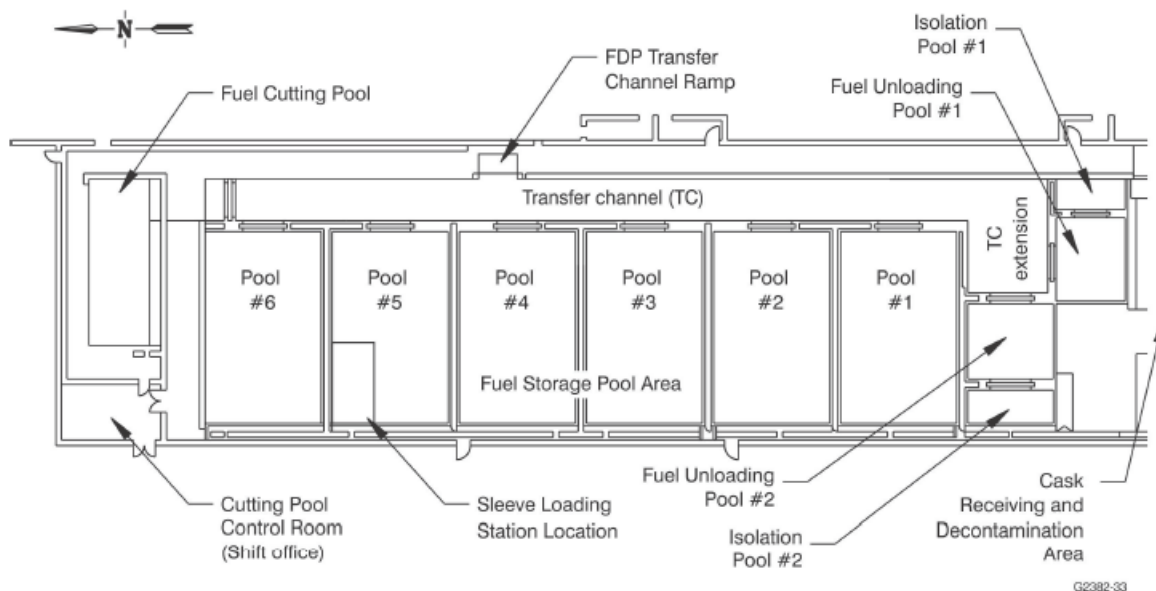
Facility Layout for the CPP-666 Fuel Storage Area
